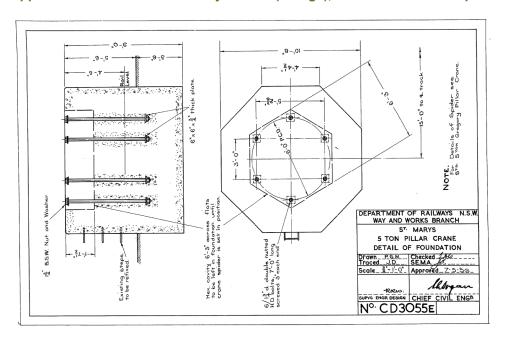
Sydney Trains plan showing St Marys Pillar Crane foundation, 1956. Source: Sydney Trains Plan Room¹⁸⁹
